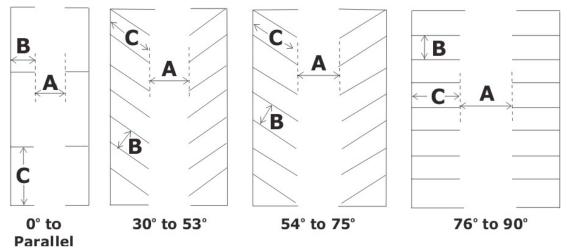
Parking space and aisle requirements based on angle of parking.
